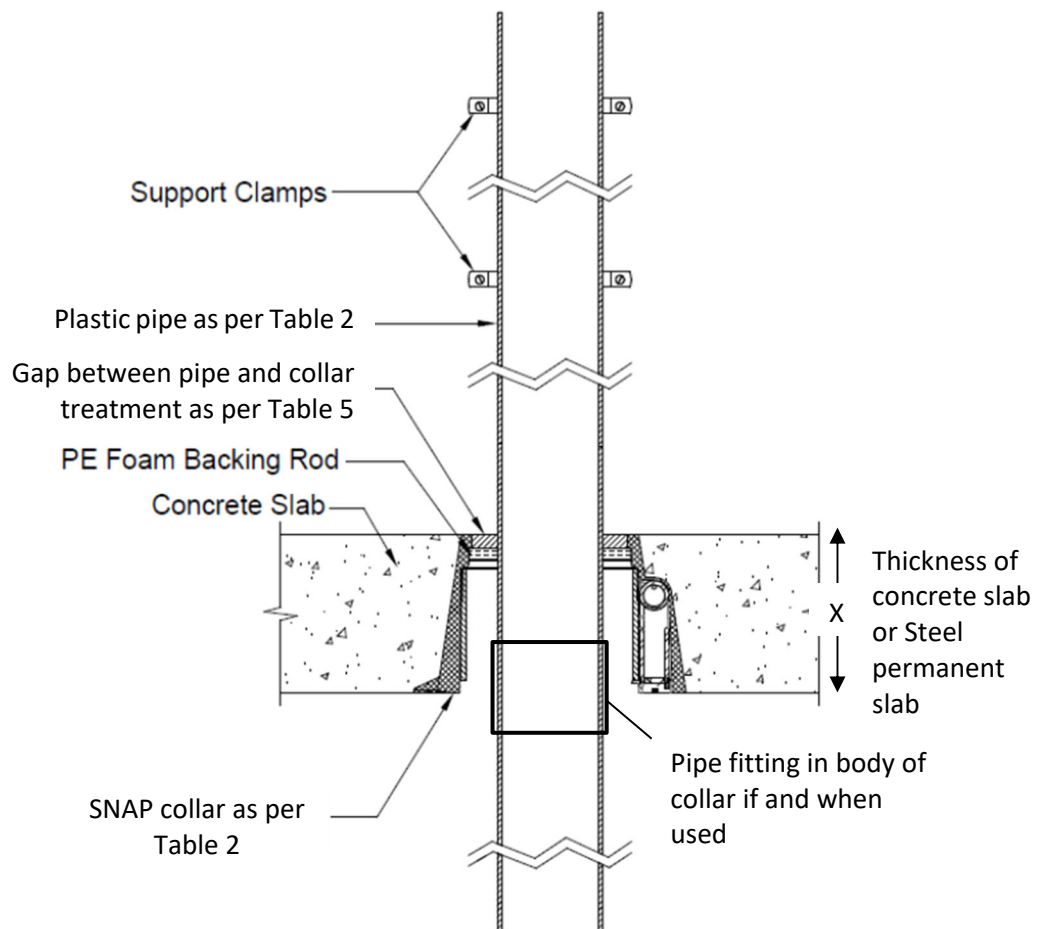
Example of installation of SNAP H100S-RR collars with stack pipes in concrete slab/concrete with steel permanent formwork slab
